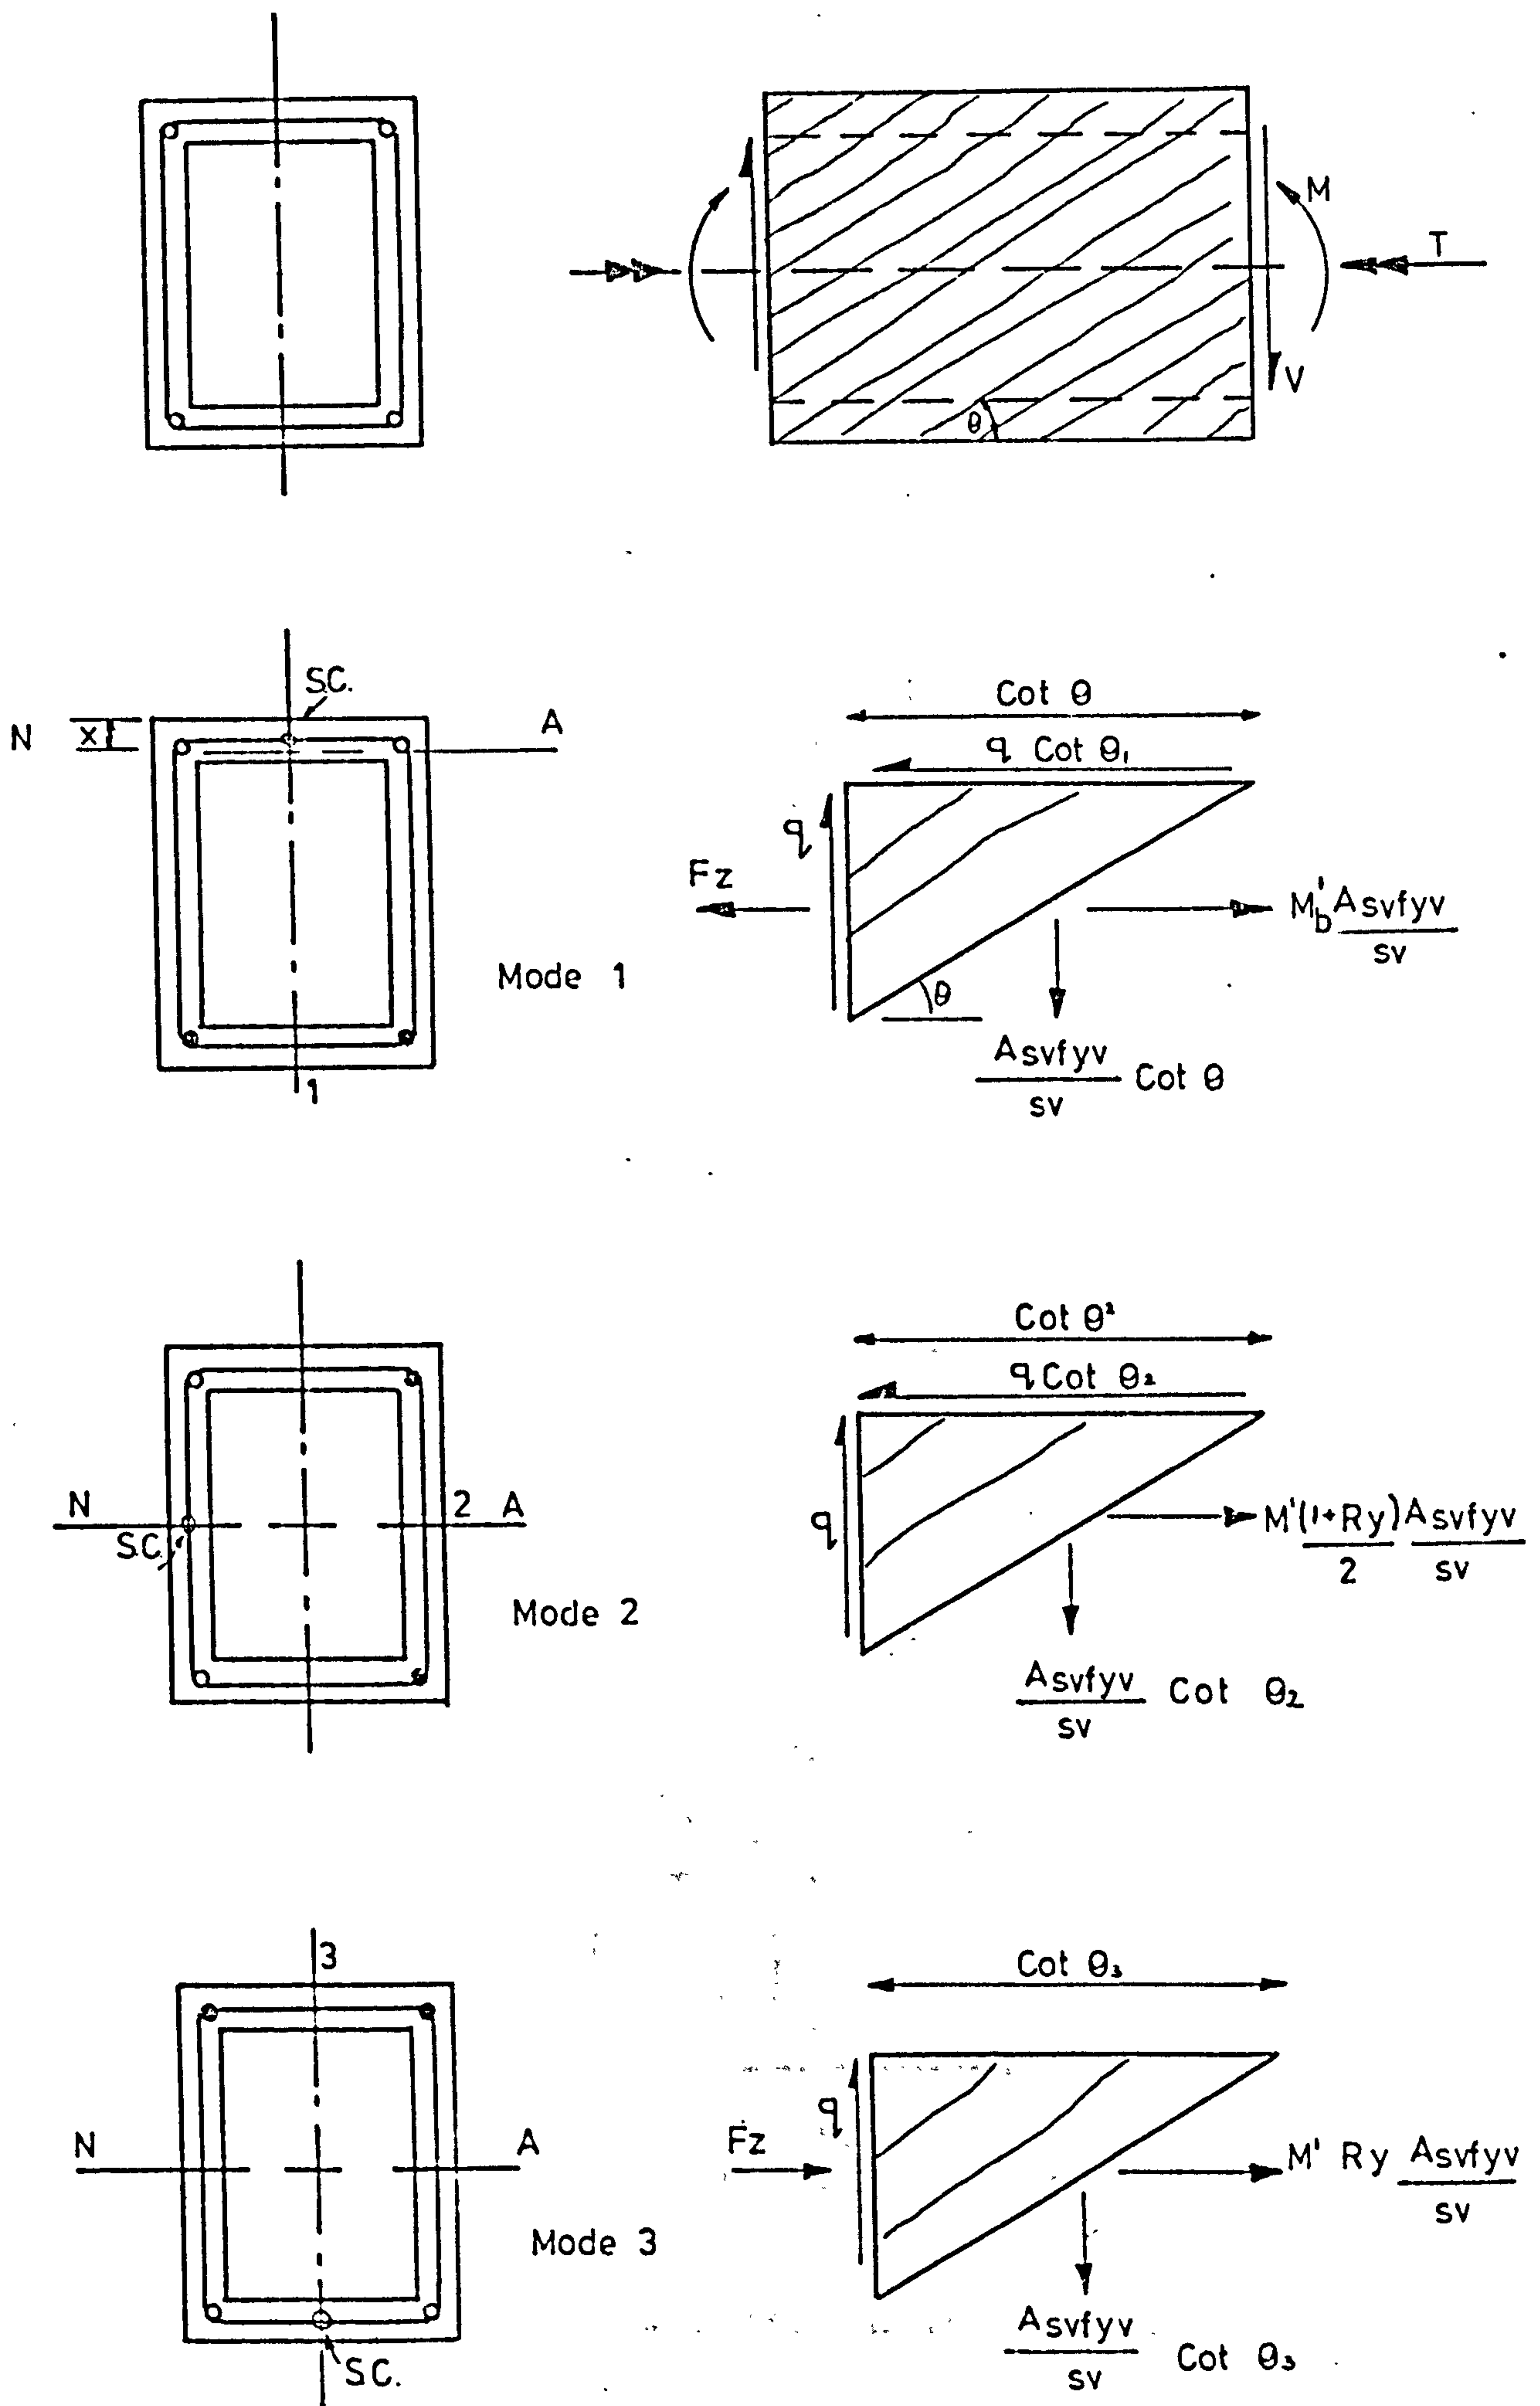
Forces Acting on Rectangular Element at Failure For Beam Subjected to Bending – Torsion and Shear.
